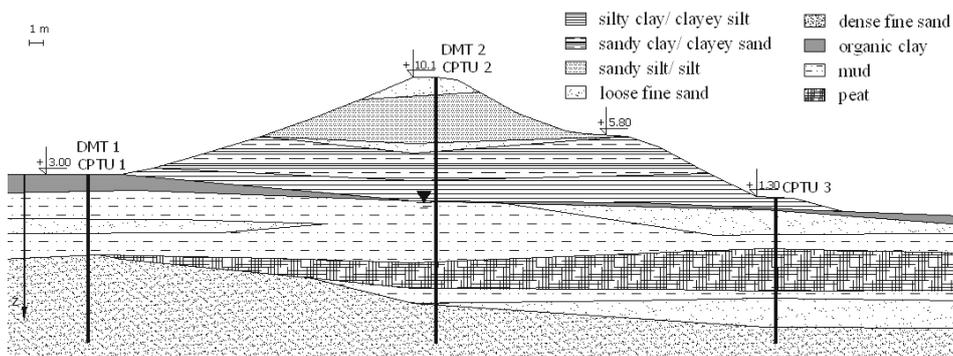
The dike and its geotechnical cross-section (Bałachowski, 2006b)
